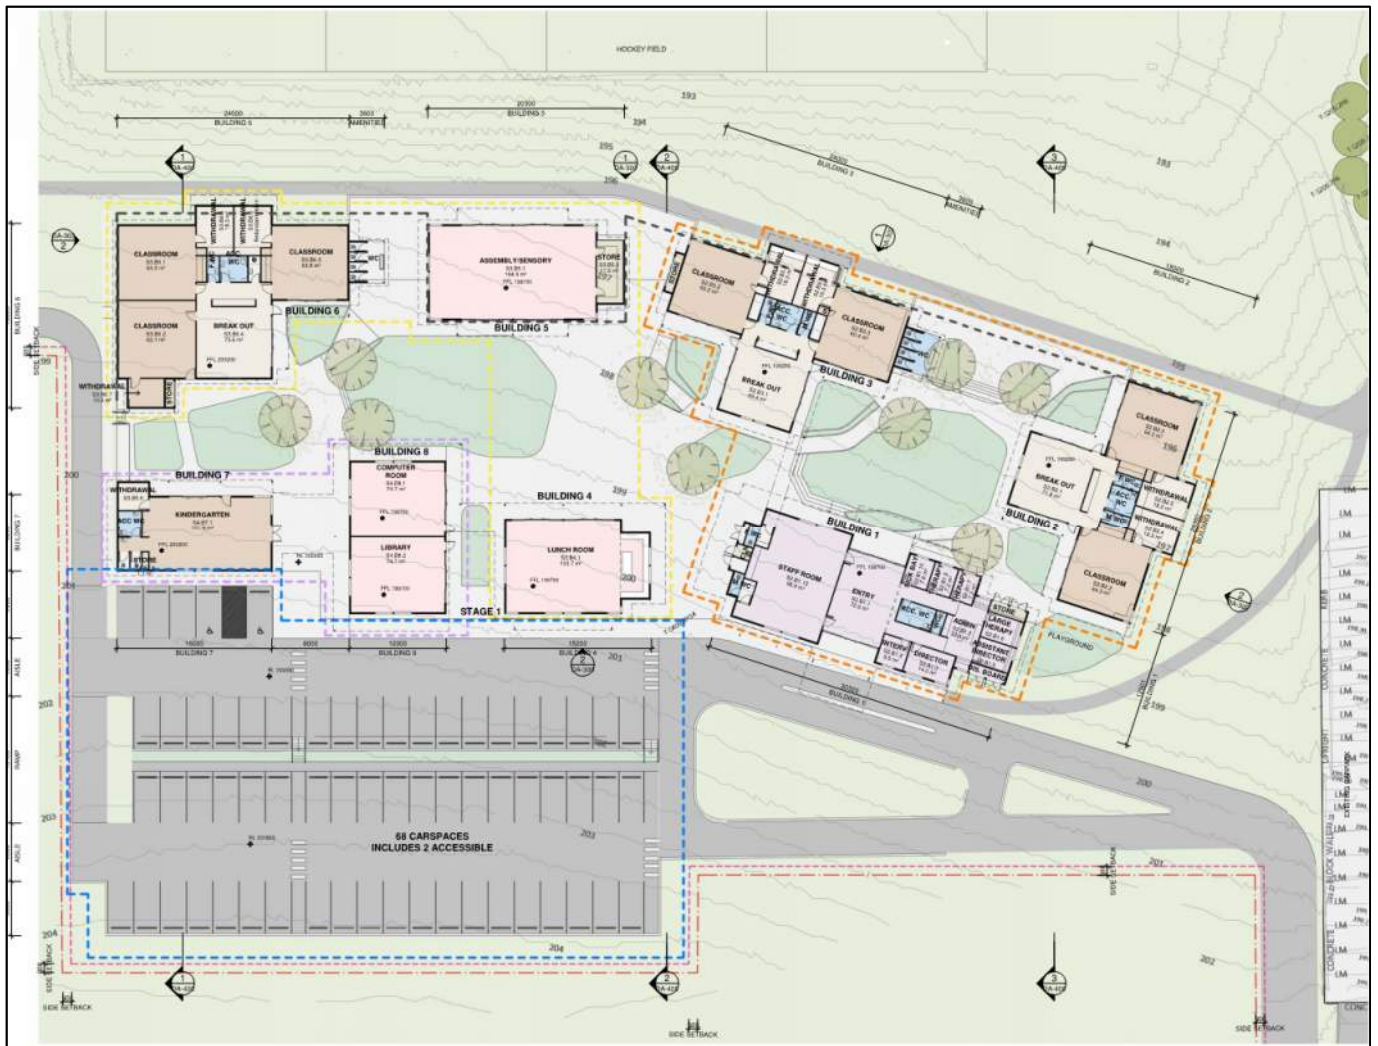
Proposed site layout (Pre-DA overall ground floor plan, dated 8/7/2019, NBRS Architecture)
